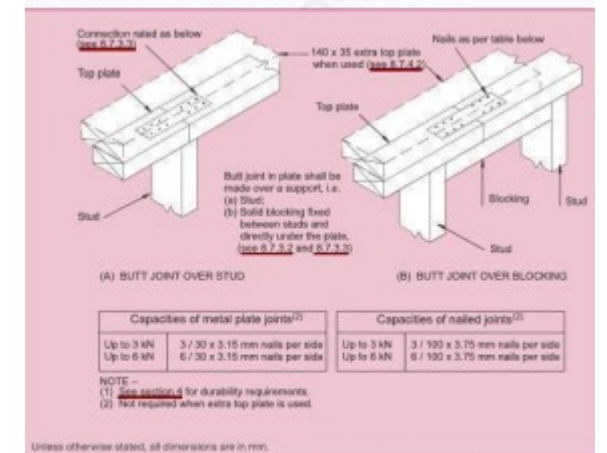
Connecting top plates in line - Walls containing bracing (see 8.7.3.3)
